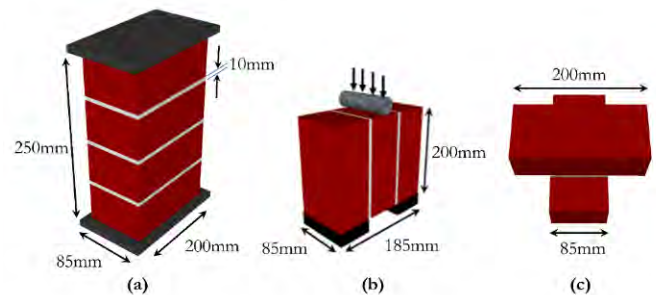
Outline of specimens used for testing; (a) compression test, (b) shear test and (c) bond test
